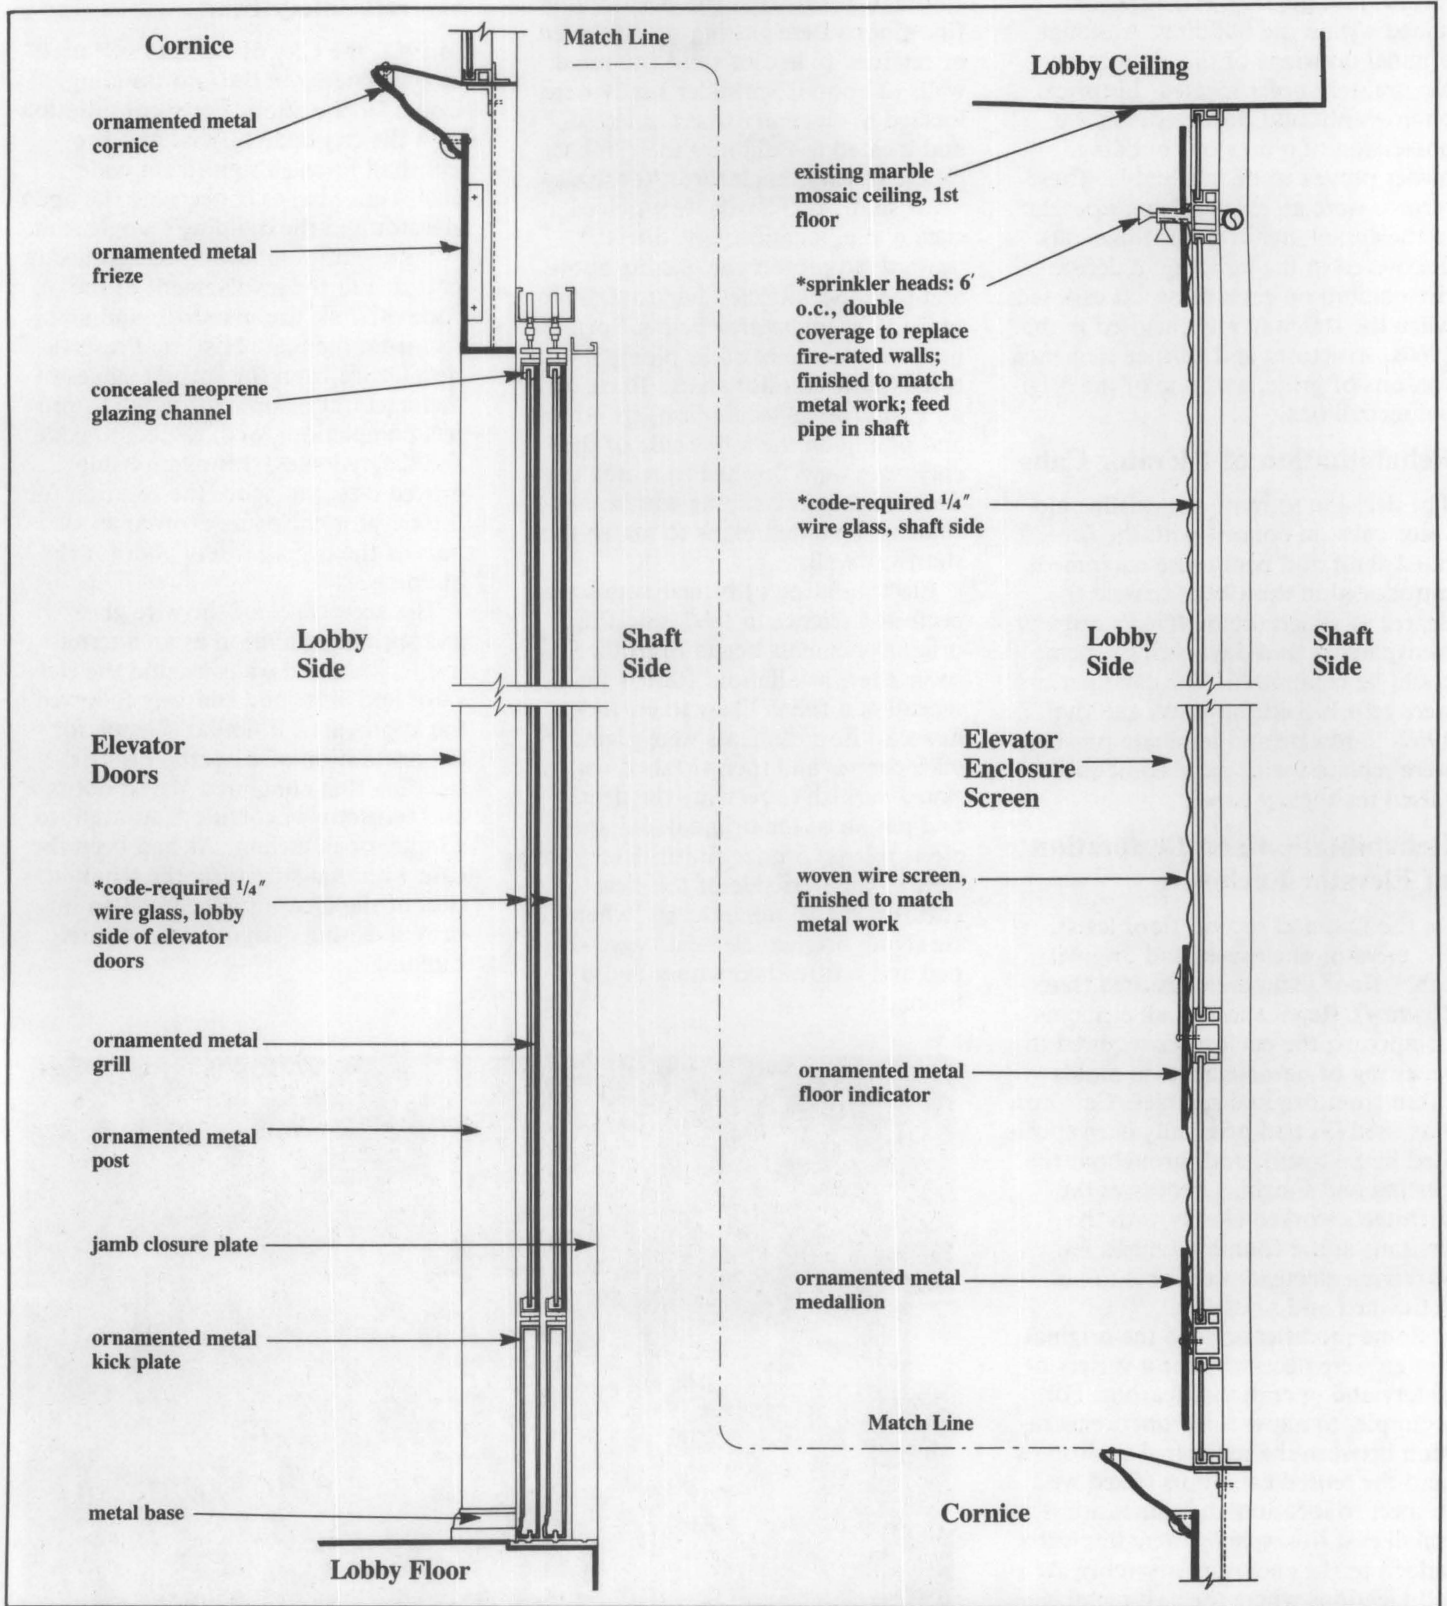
The reconstruction of the elevator enclosures was a complex integration of code-required features (marked by an *) and architectural elements. Wire glass and double-coverage fire sprinklers replaced fire-rated walls while retaining the quality of light in Sullivan's original design. The metal ornament was reproduced in copper-plated cast iron and finished with a tinted varnish to match the original bronze electroplated finish.
